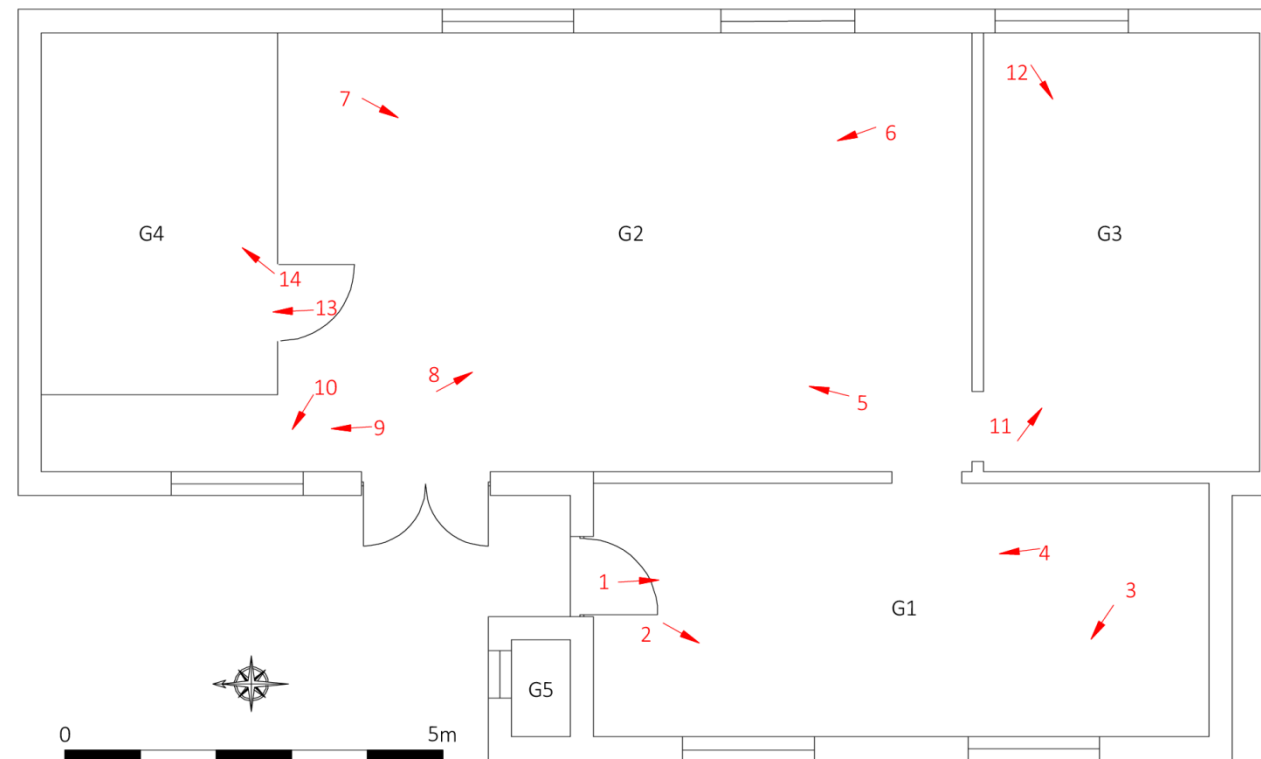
Old Telephone Exchange photo plan (scale 1:100)
